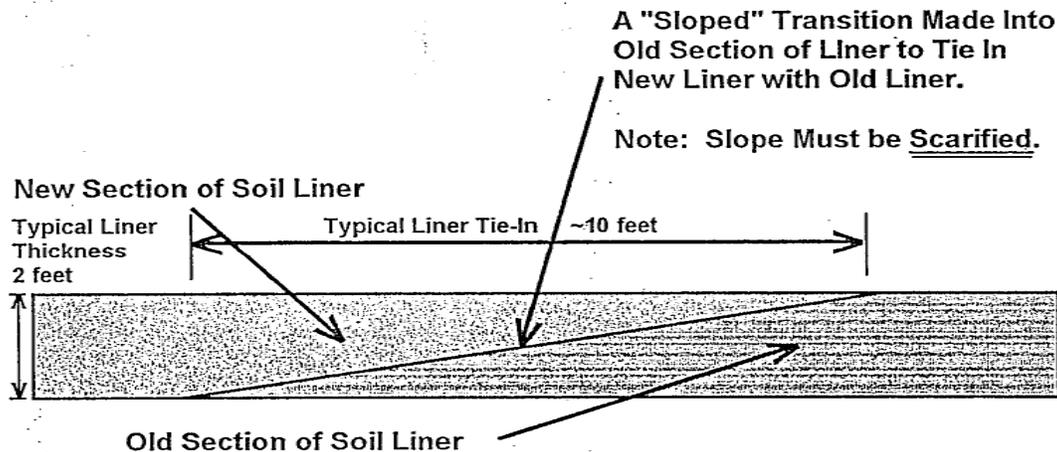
Constructed Soil Liner Sloped Tie-in Detail
